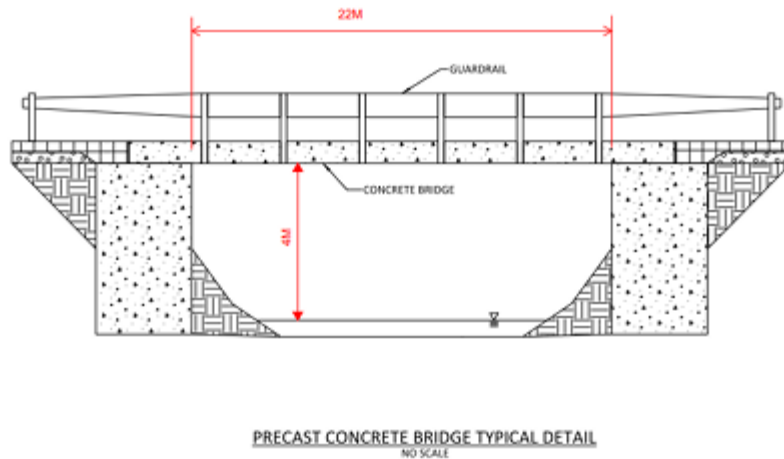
Design of the precast concrete bridge that will span the Ralappane Stream at the entrance to the Proposed Development
